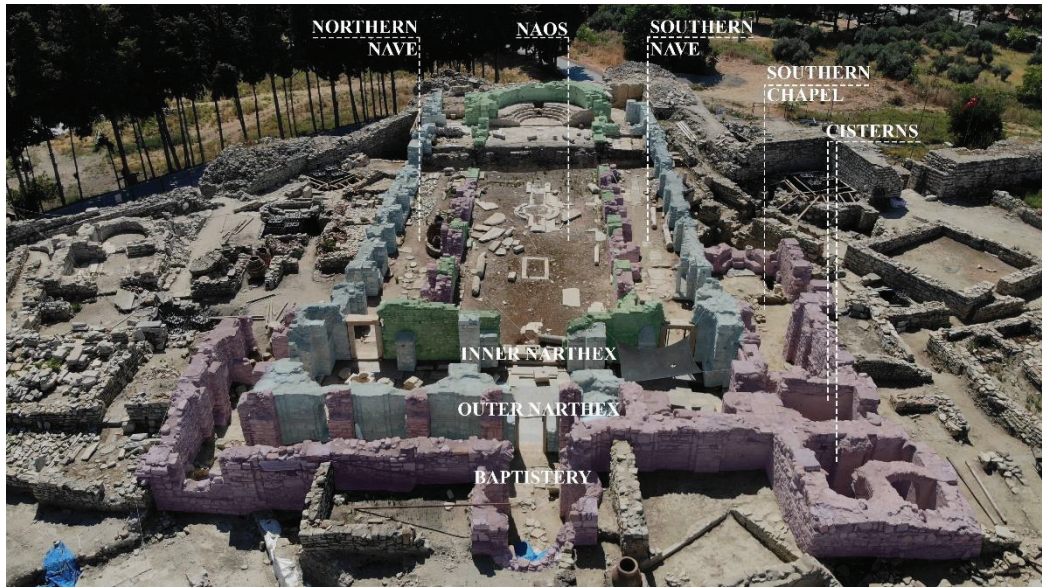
Photo of Anaia Church showing the spaces and their construction periods (Colours indicating the periods were expressed in Figure 3.11) (Revised from Kadıkalesi/Anaia Excavation Archive, 2021)
